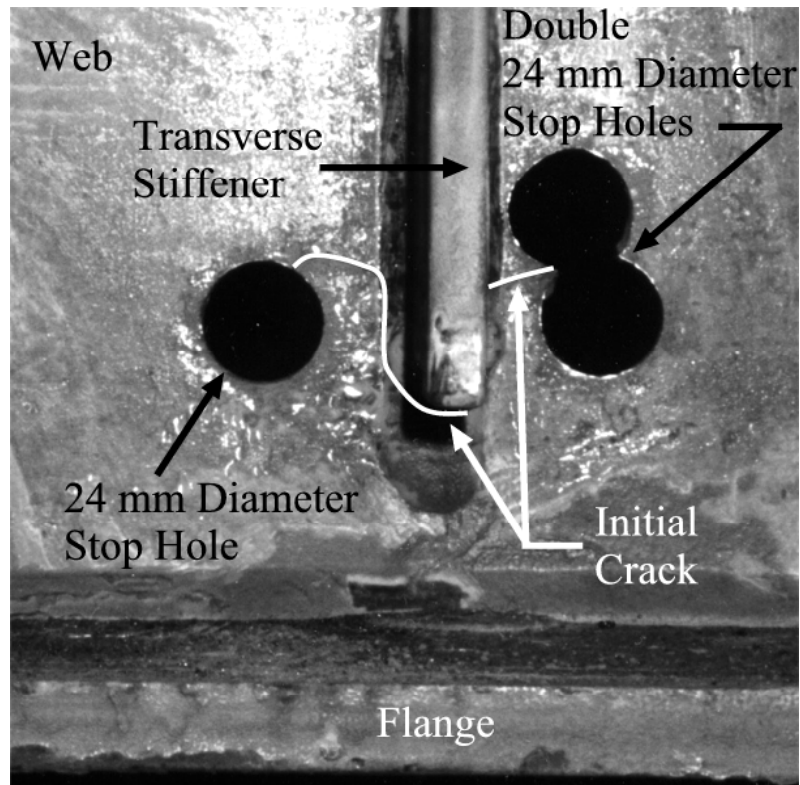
Typical Location of Stop Holes and Initial Cracks in Test Specimens
